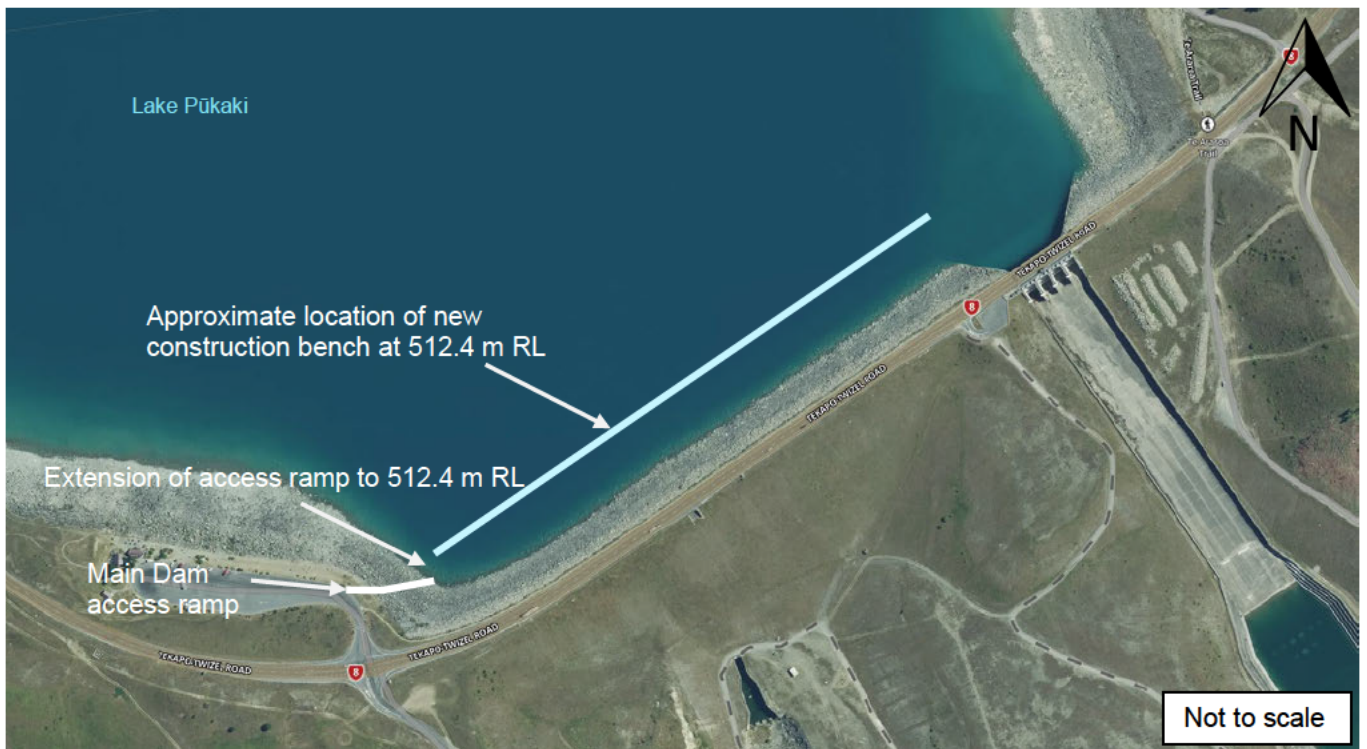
Site plan (Main Dam) – Tranche 2 - indicative 512.4 m RL construction bench
